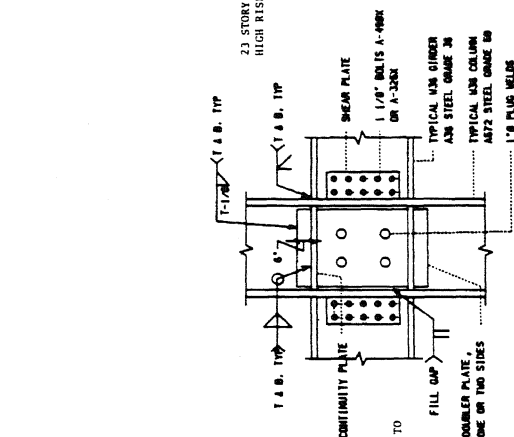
TYPICAL BEAM/COLUMN JOINT DETAIL
